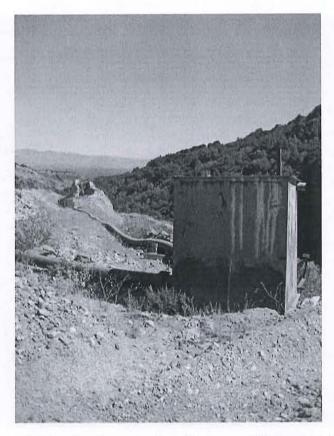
View of piping diverting water from the quarry pit to Pond 4 in the distance.
